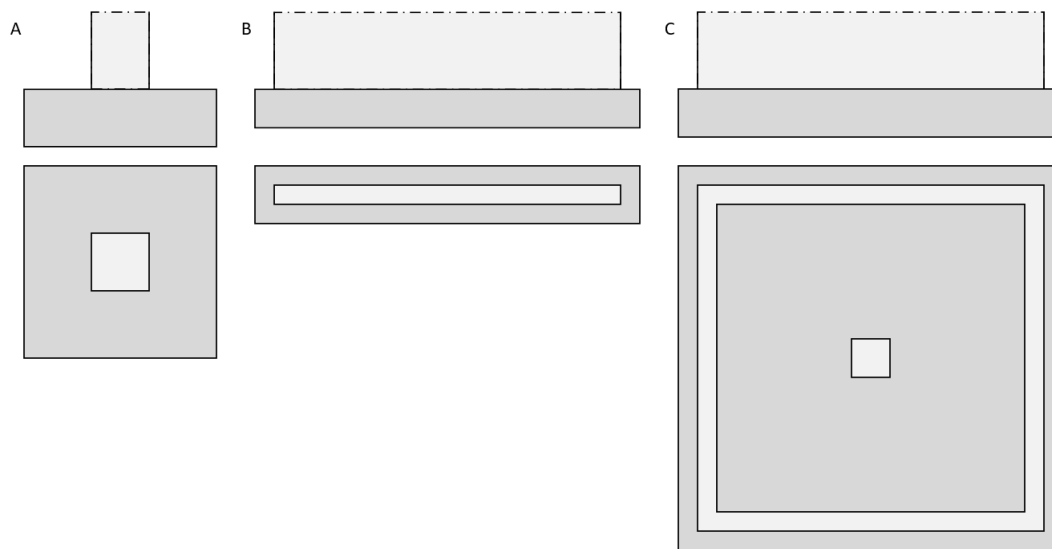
Pad foundation (A), strip foundation (B) and raft foundation (C)
